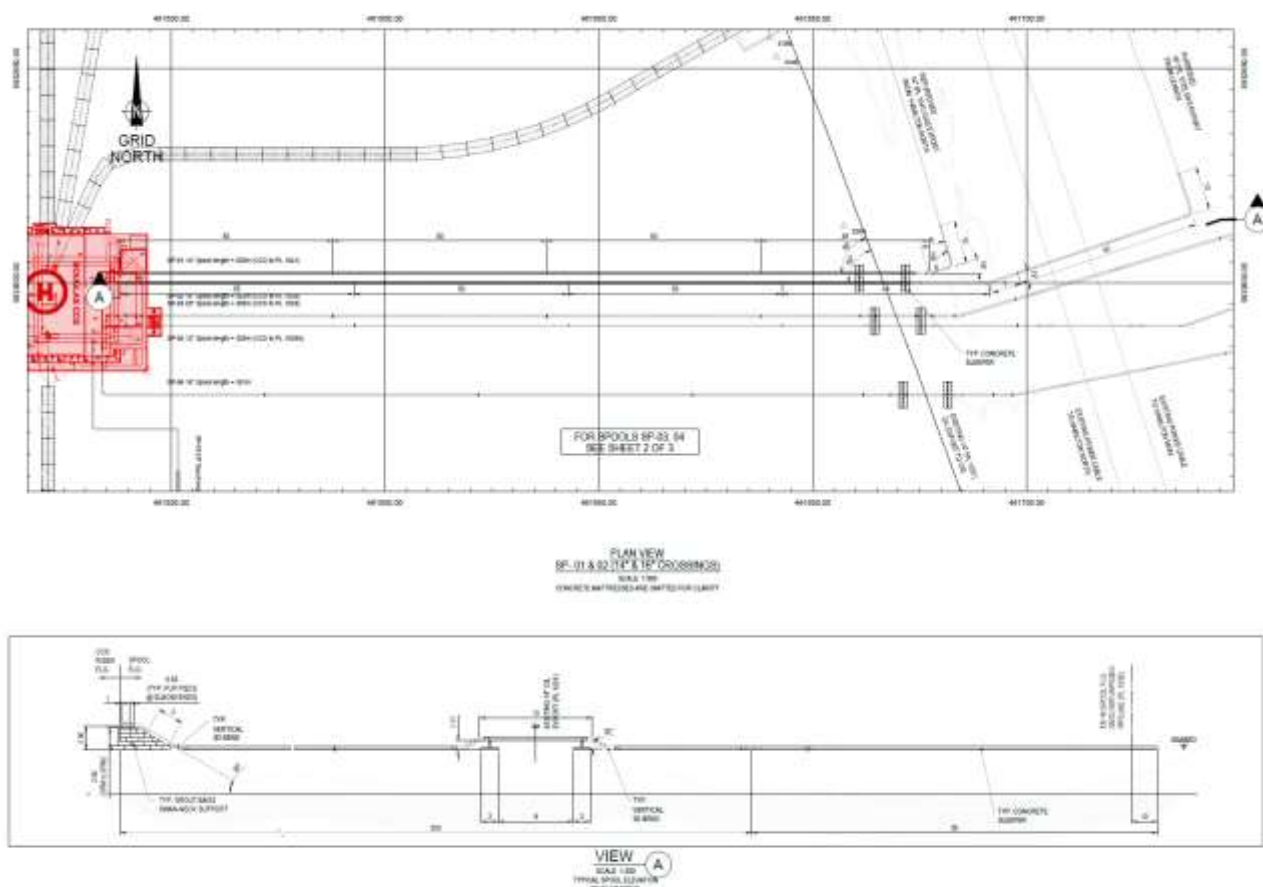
Proposed Concrete Sleeper at Pipeline and Cable Crossing (At Douglas CCS Platform) for Spools 14in PL1041 & 16in PL1035
